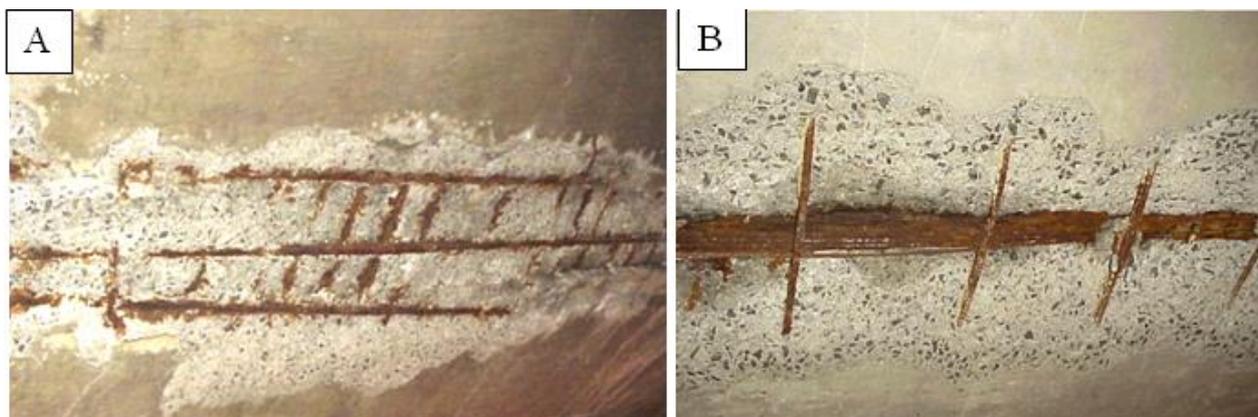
Deteriorated Concrete and Rusted Reinforcement at the Bottom of Ramp Slabs:
